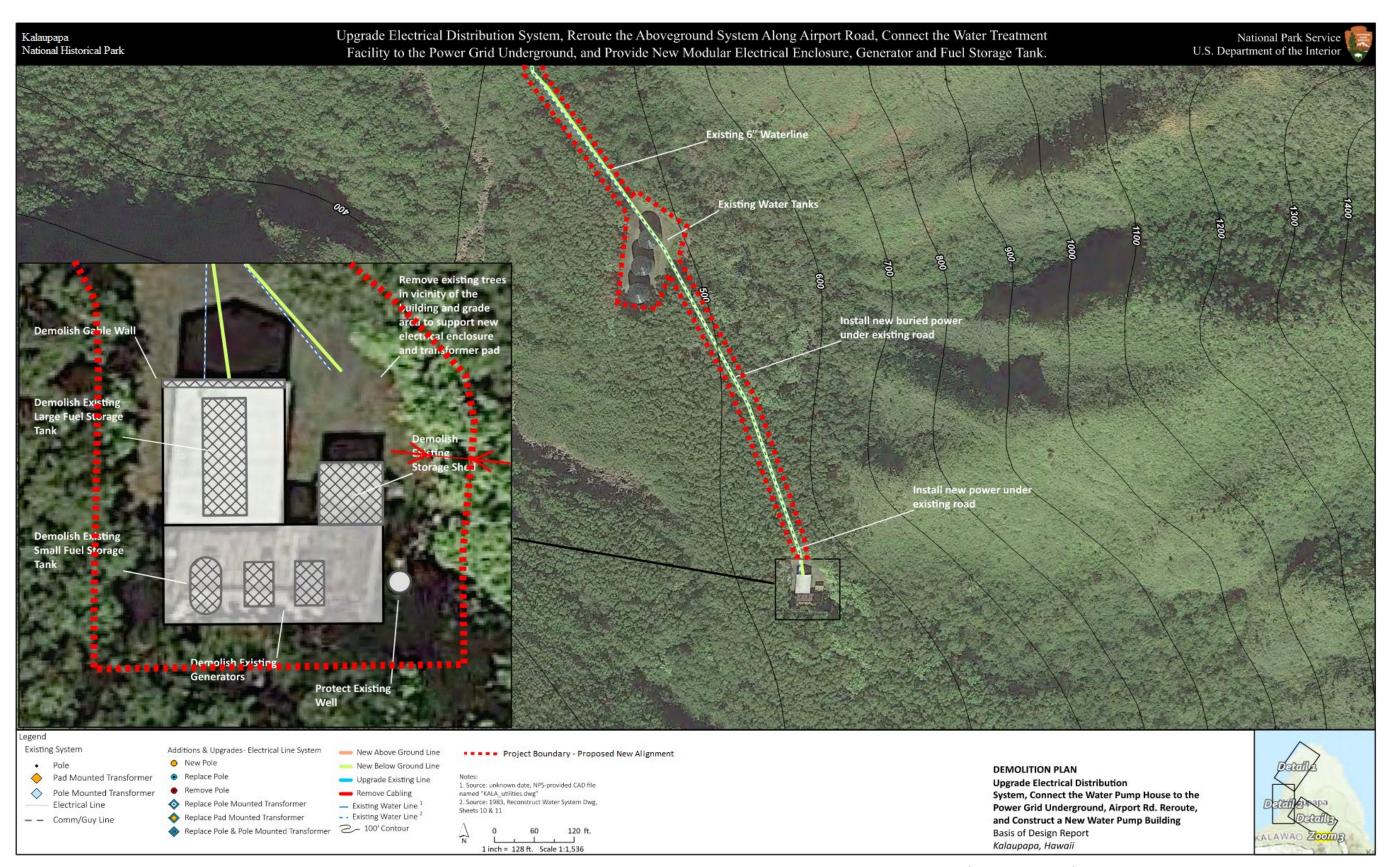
ALTERNATIVE 2 WATER PUMP HOUSE GENERATOR AND AUXILIARY EQUIPMENT DEMOLITION (OPTION 3 SHOWN)
